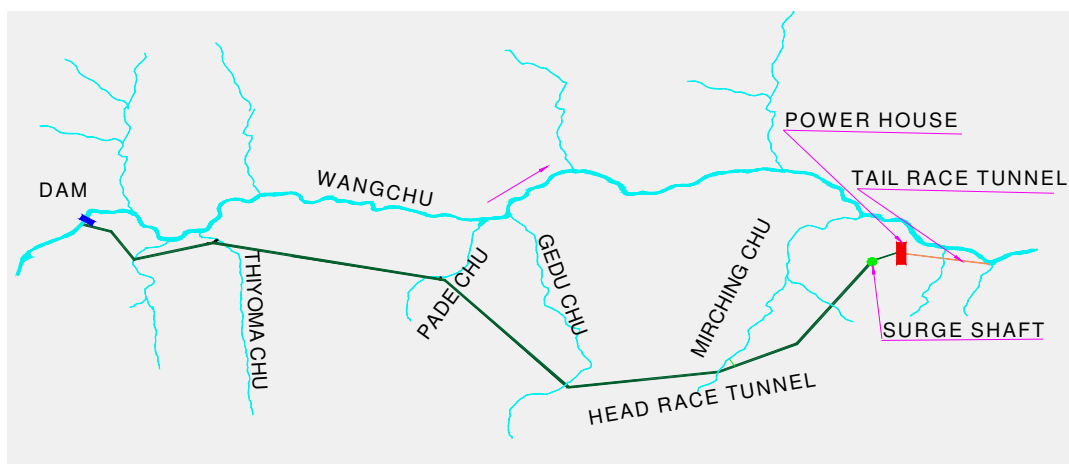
Layout plan of Tala hydroelectric project, Bhutan
